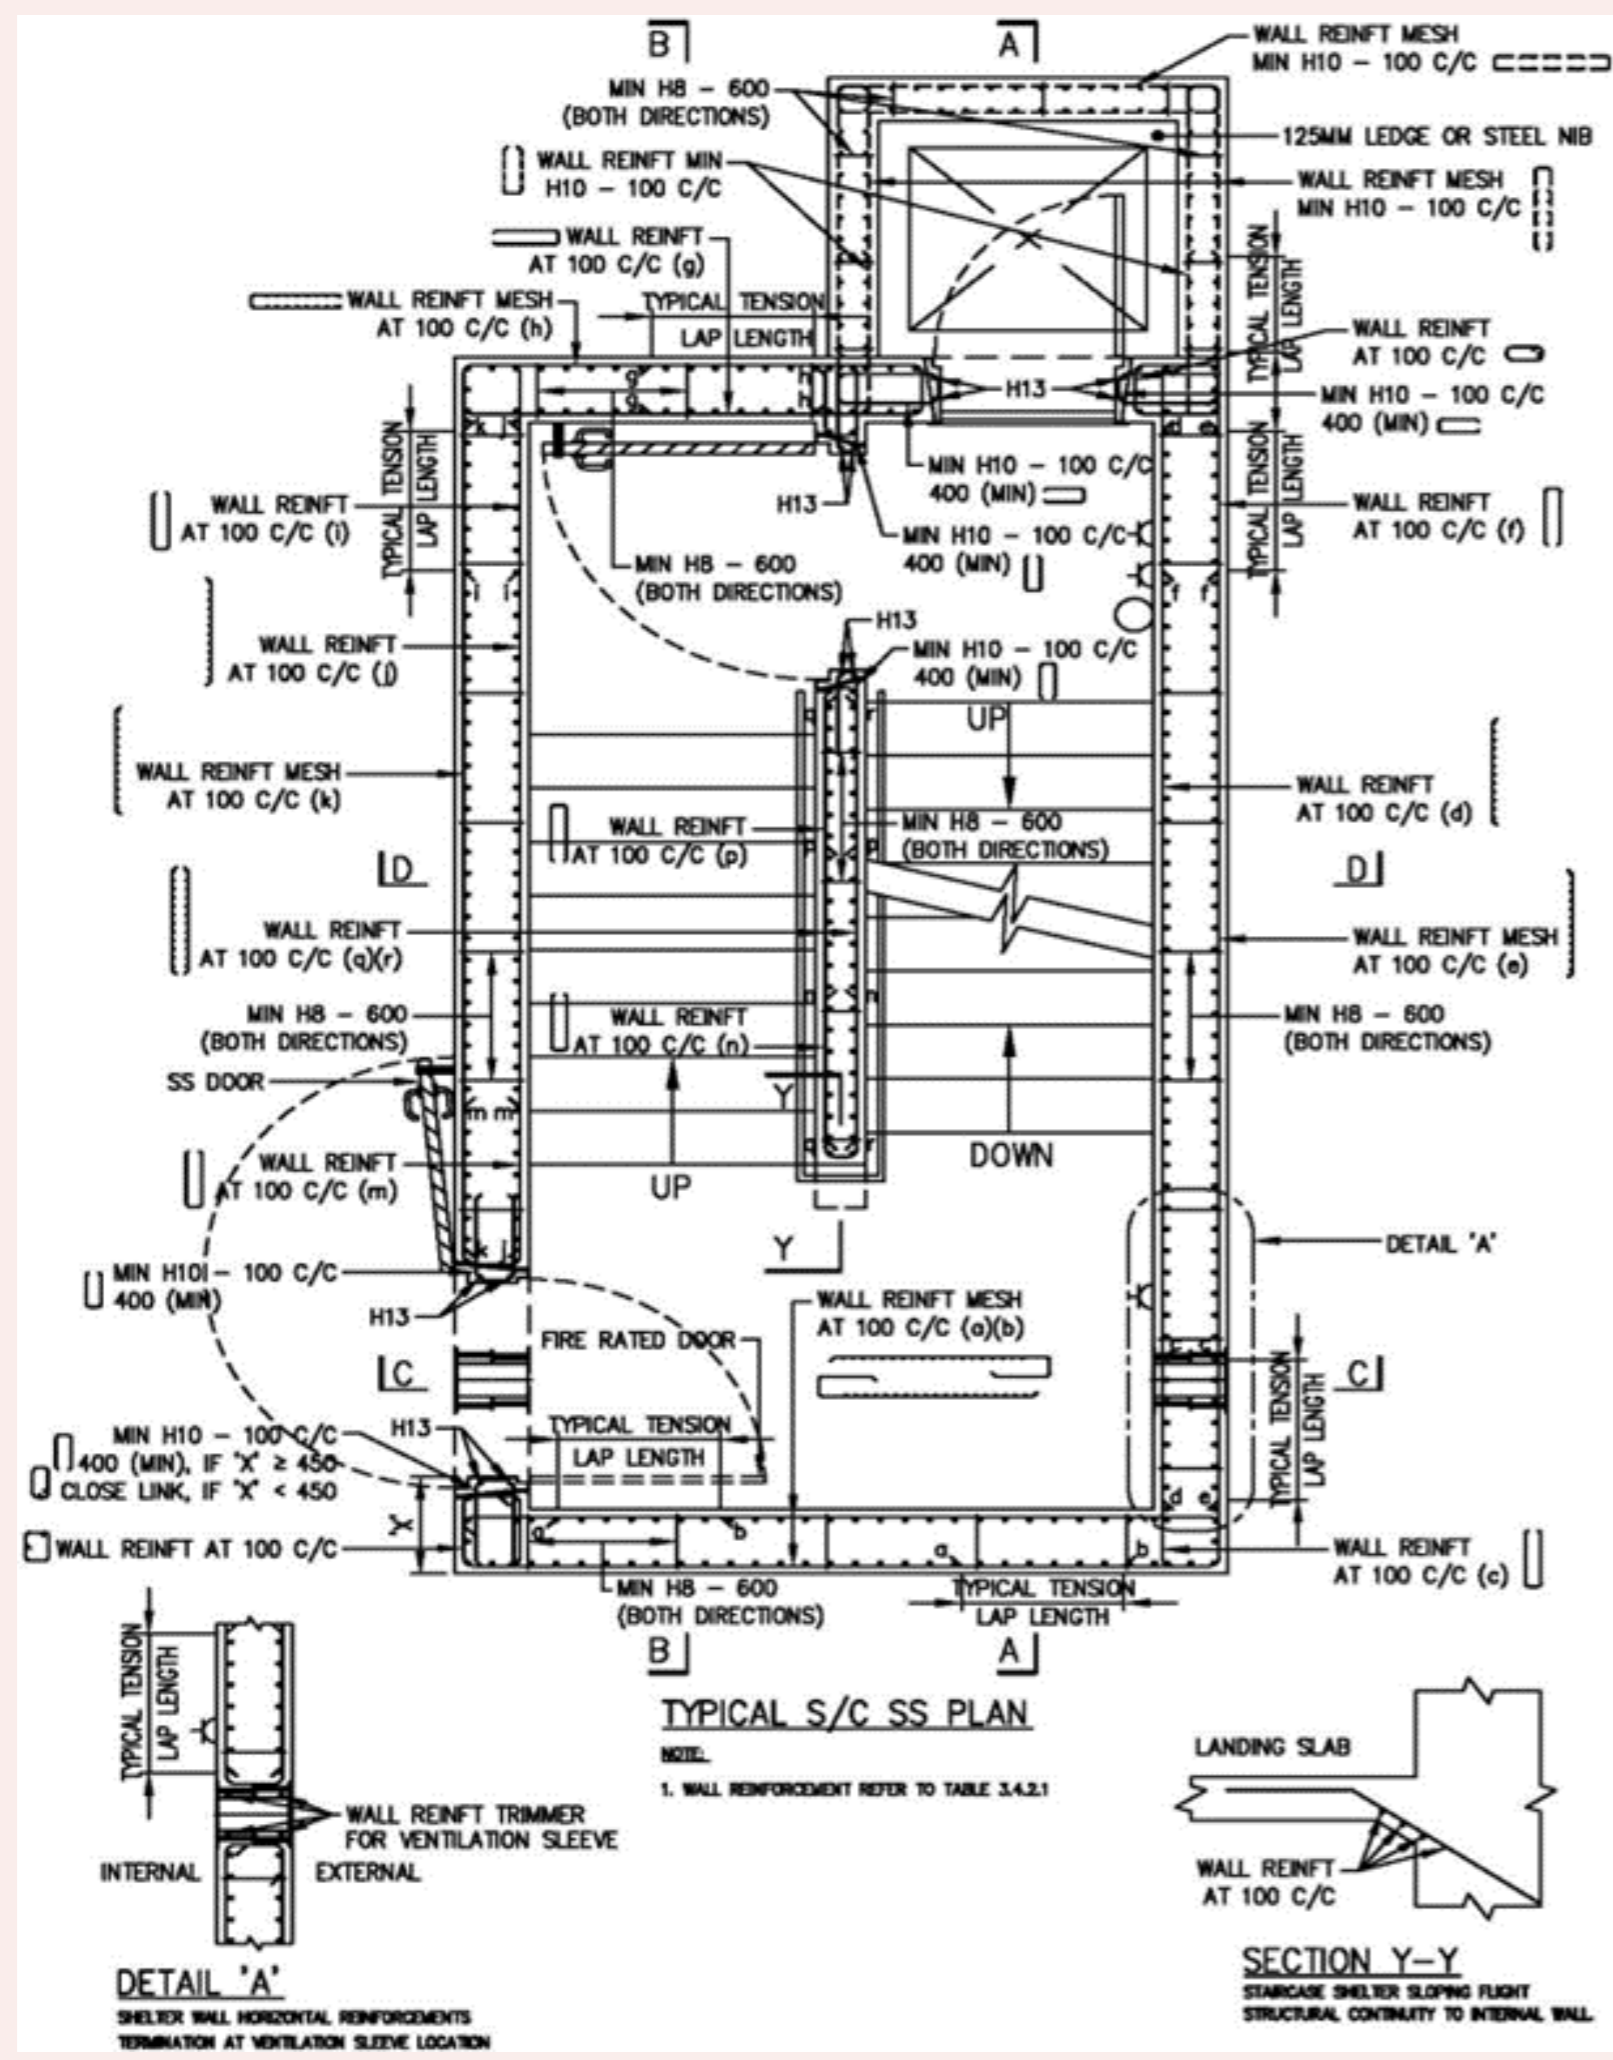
(k): SECTIONAL DETAILS OF SS SLABS/ WALLS FOR S/C SS
